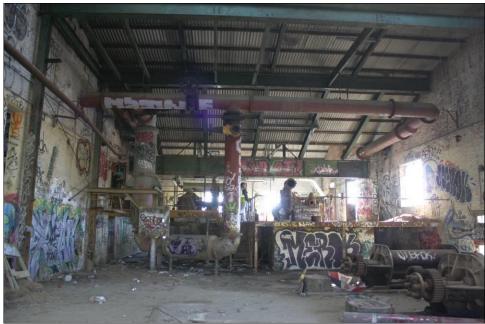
Building 2, interior of Engine Room, view southeast.
